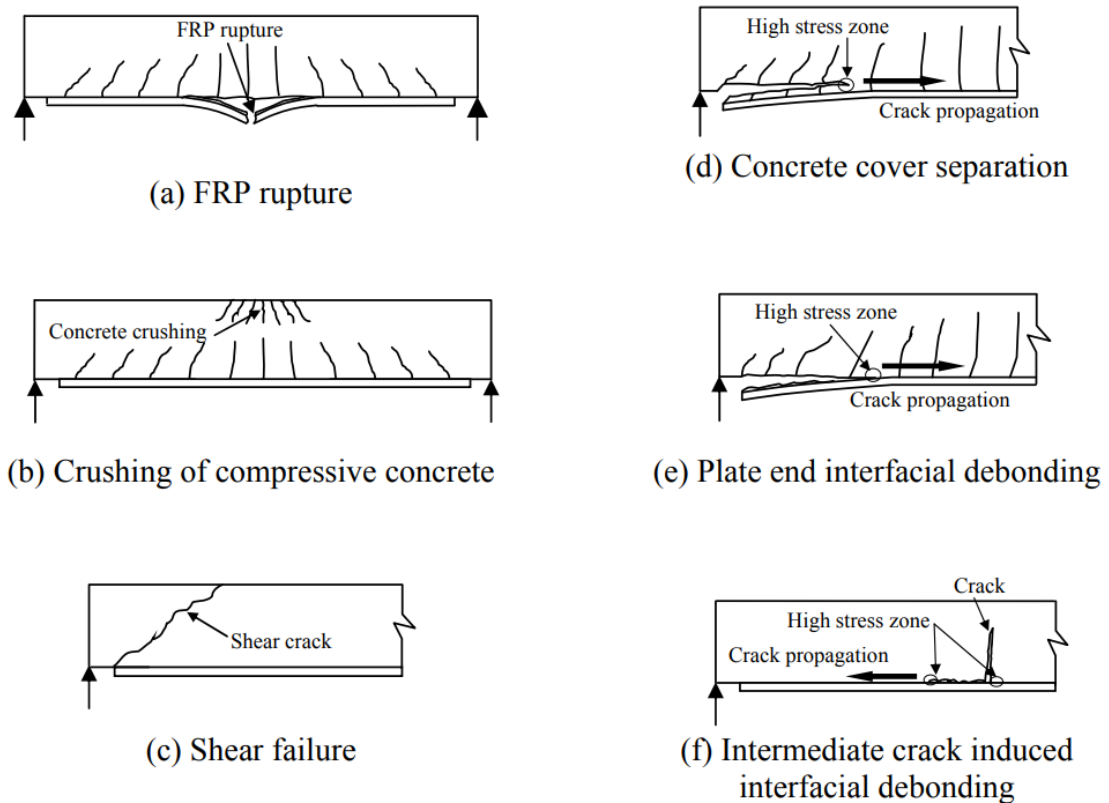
Failure modes of FRP-strengthened concrete beams [Teng et al. 2003].
